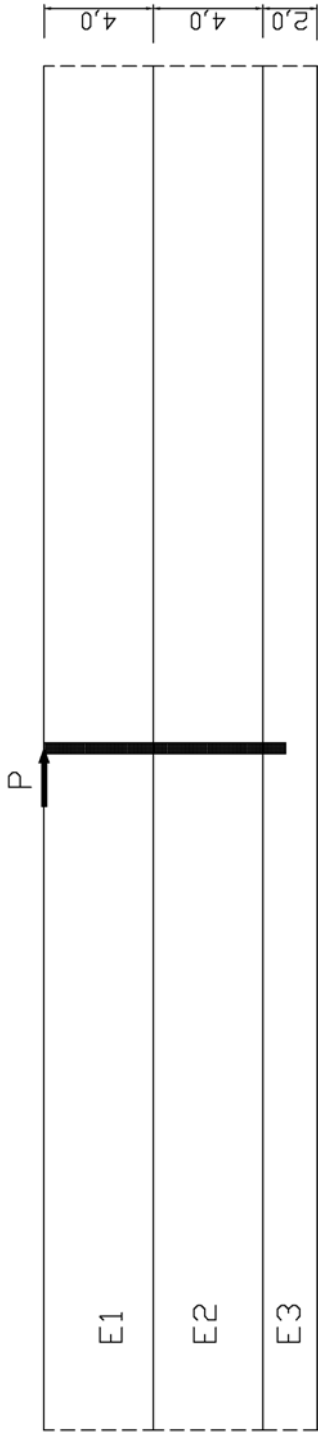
Sheet pile wall embedded in a layered soil and subjected to horizontal force
